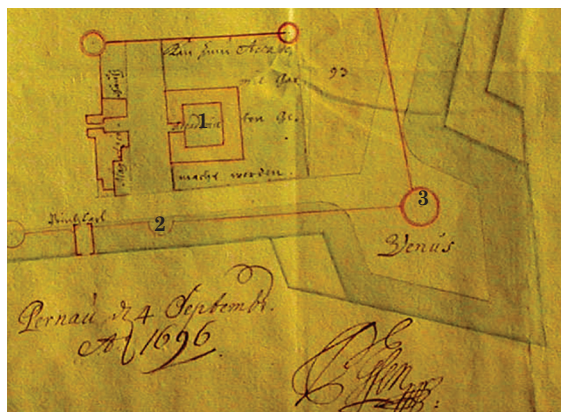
The plan of Pärnu from 1696. 1 – castle; 2 – outer bailey; 3 – tower on Venus bastion.
